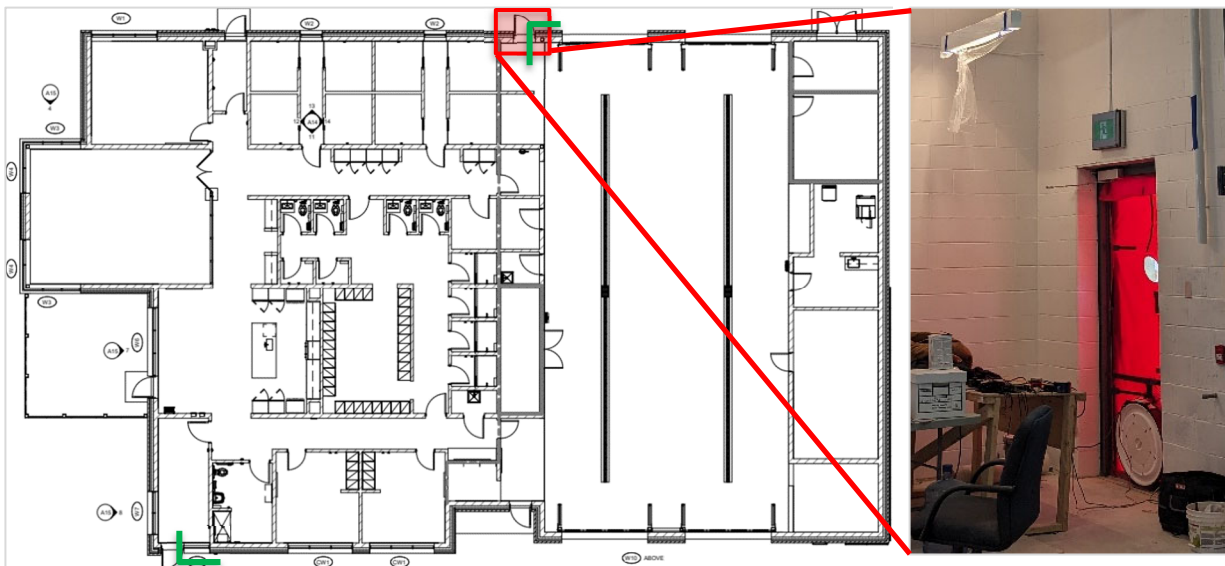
Floor plan (by HOSSACK) with blower door location (red) and pressure tap locations (green)
